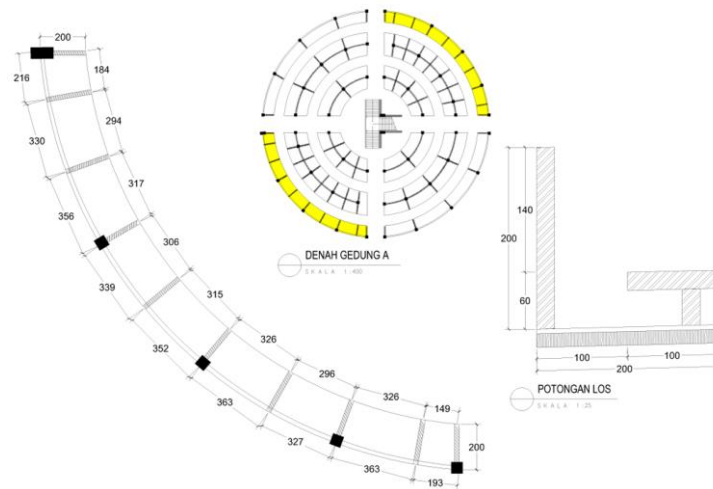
One-Faced Nine-Row Kiosk Layout Block 3 (Building A) (source: author)
